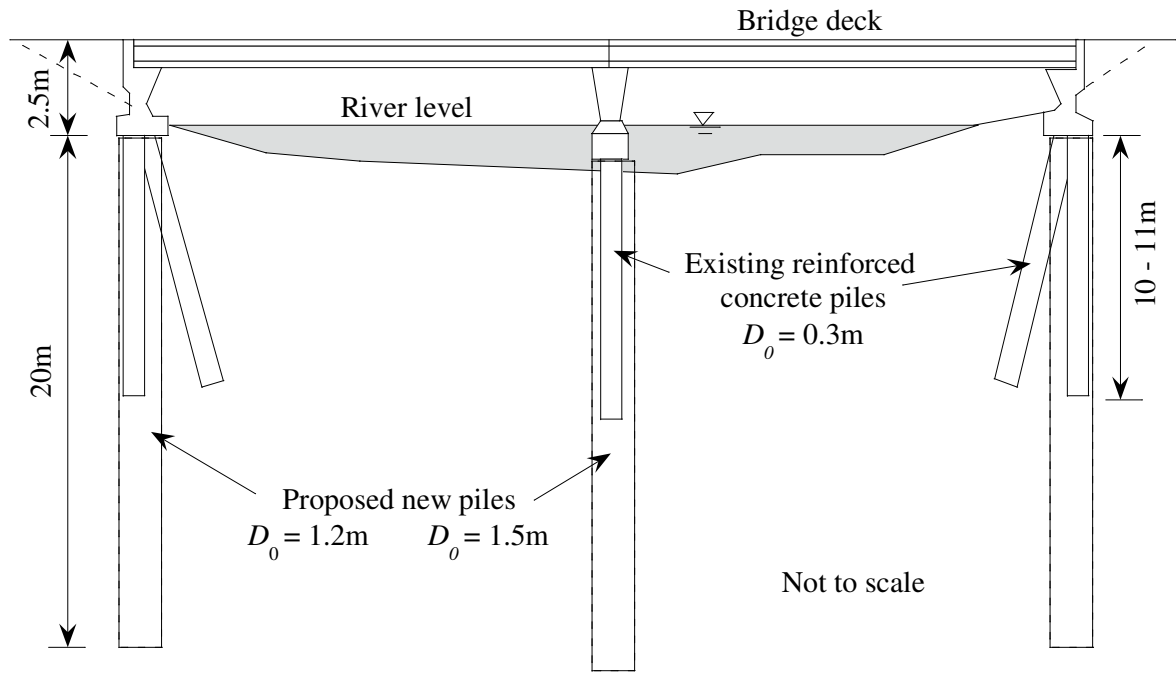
Bridge cross section showing existing piles and proposed new piles
